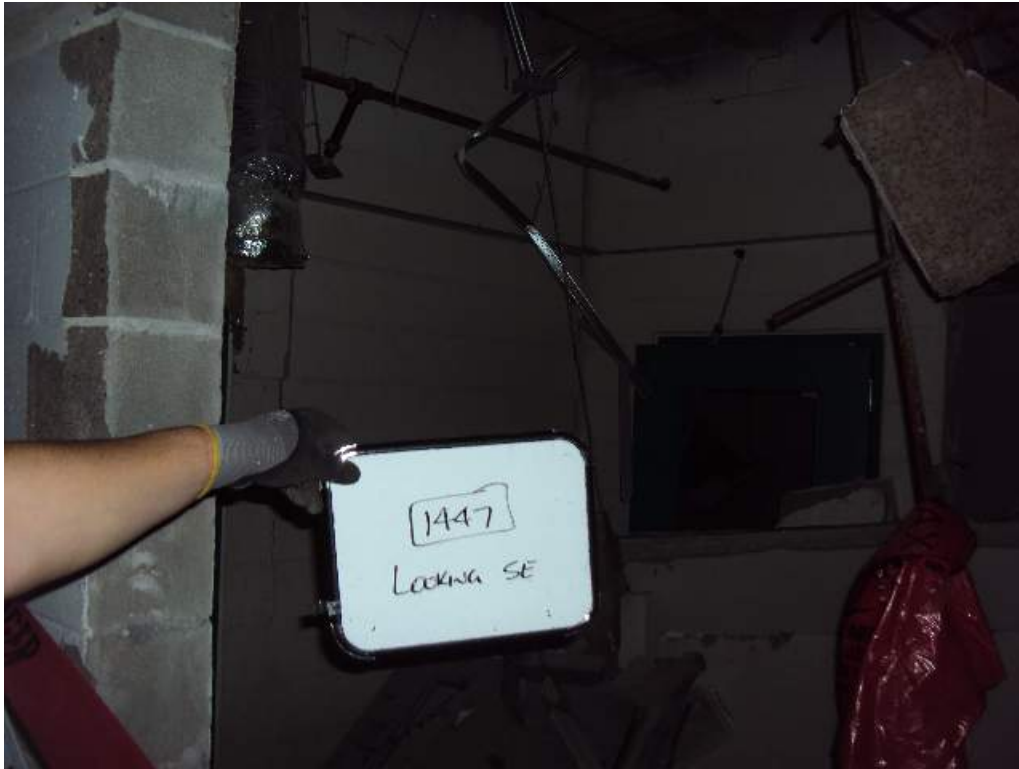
1st Floor –Room 1447 – Between column lines G and H & 4.3 and 5.5 – Looking Southeast – Collapsed CMU wall
